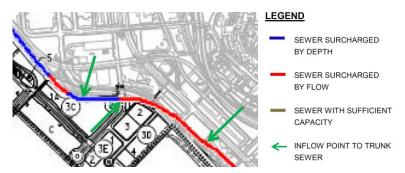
Existing Trunk Sewer along Hoi Bun Road
